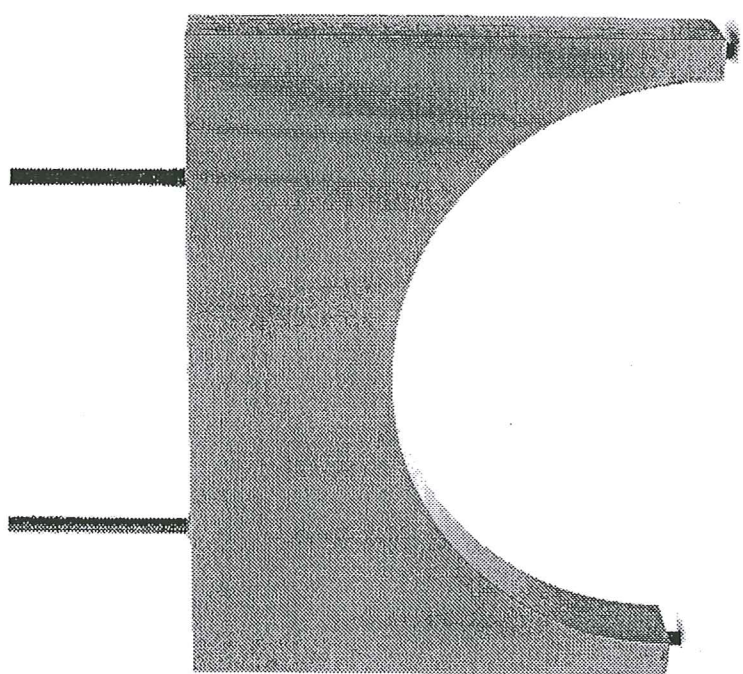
SINGLE SEMI-CIRCULAR ARCHED BRIDGE
